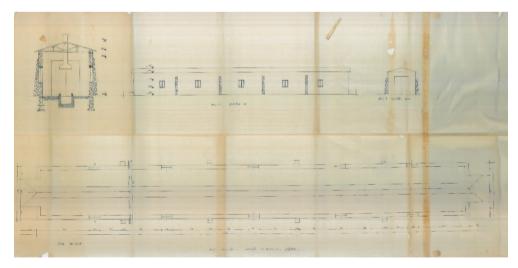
Drawings of Cer Building in 1966 (TCDD Archive)
